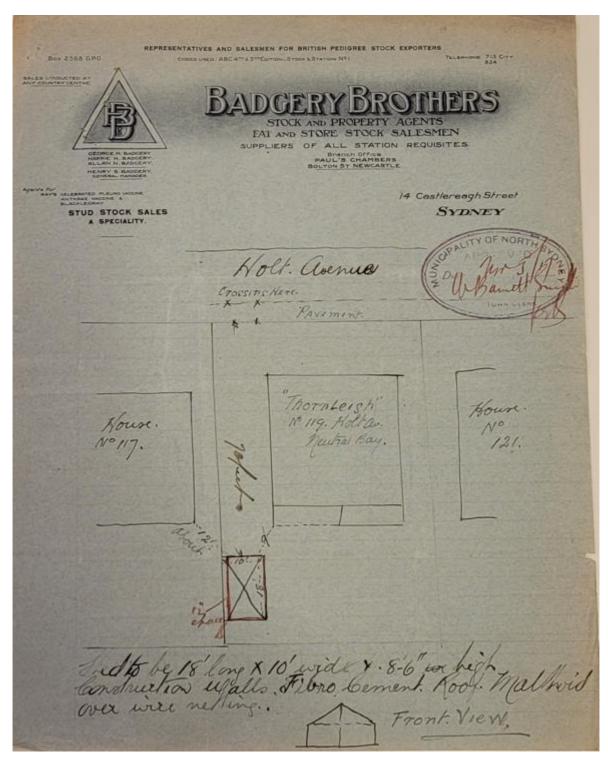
Sketch plan for proposed garage, 1927. (Source: NSMCA 91/5.? 1927)
